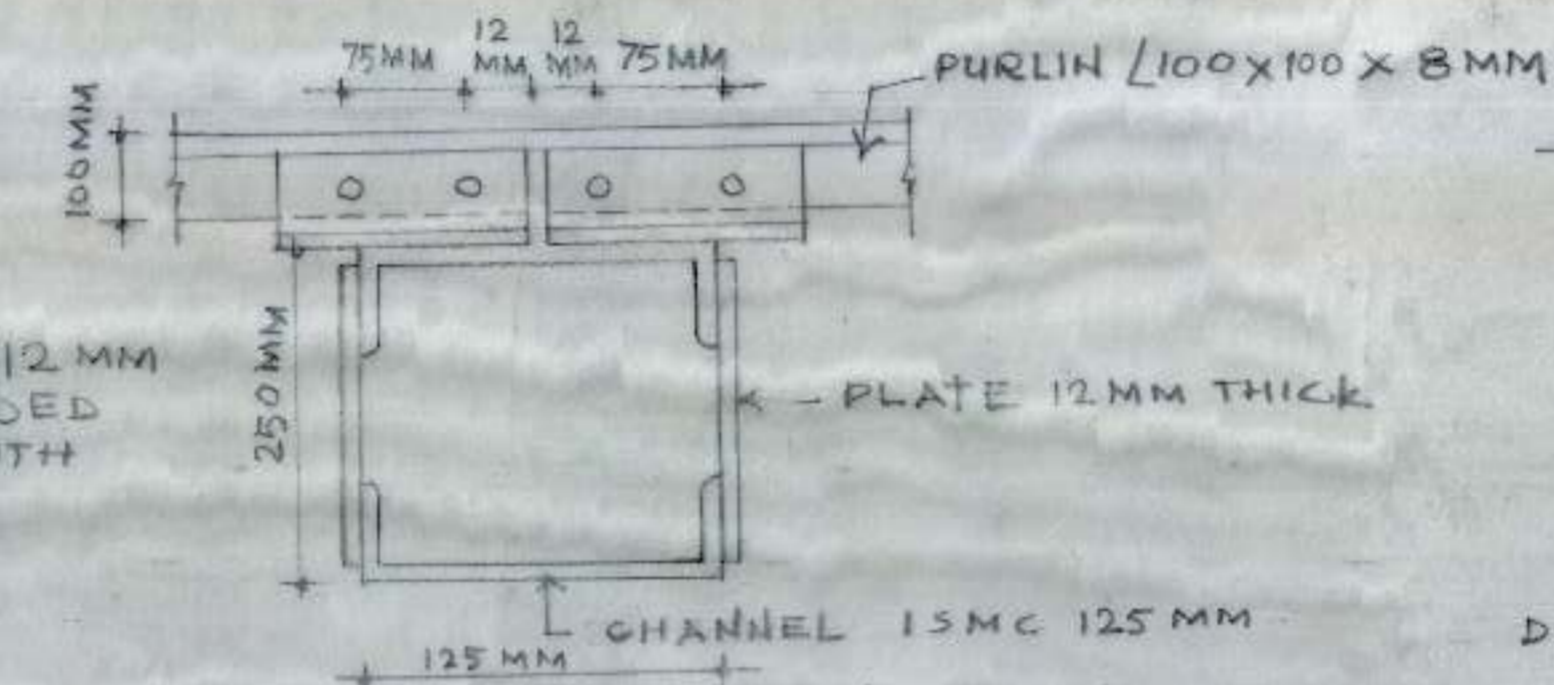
DETAIL 'D' SHOWING KNEE JOINT OF MAJOR PORTAL
